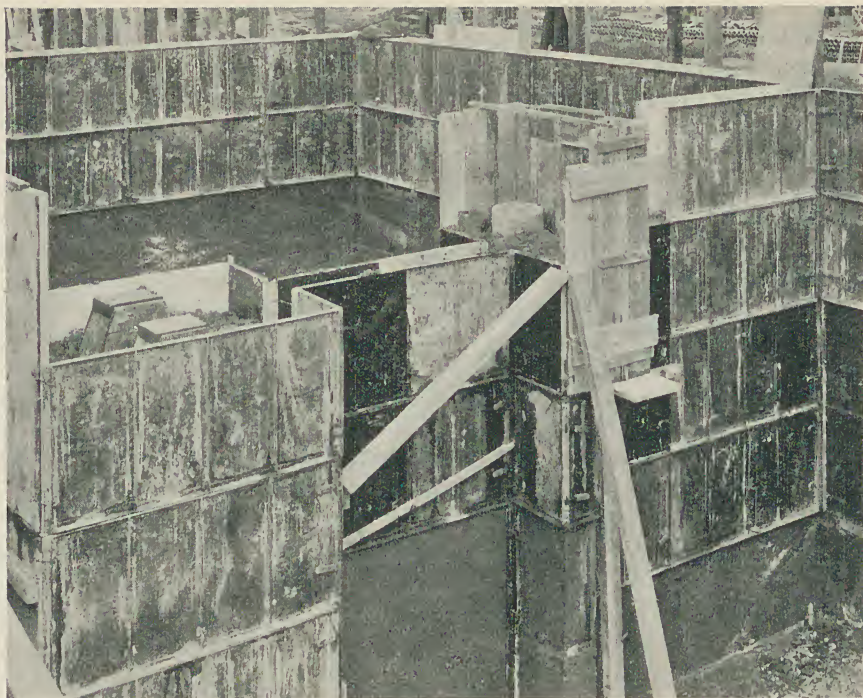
CONCRETE CHIMNEYS IN COURSE OF CONSTRUCTION.
